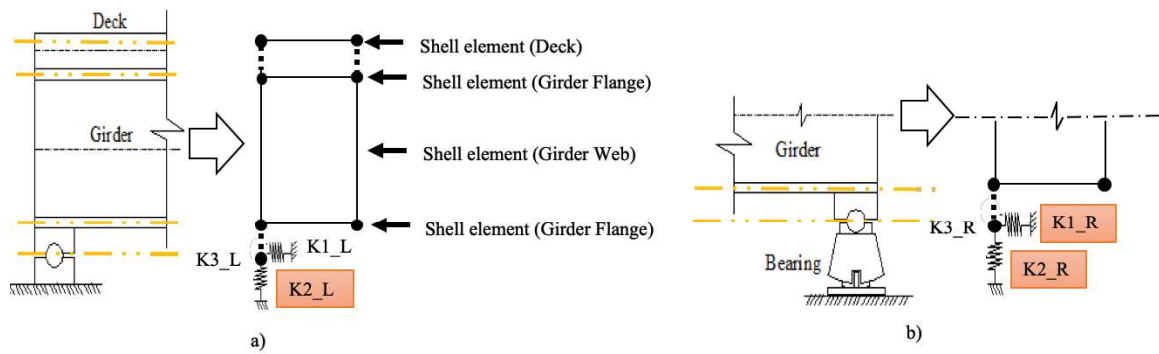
Details of bridge bearings: a) fixed bearing; b) expansion bearing; L and R stand for Left (South) and Right (North)
